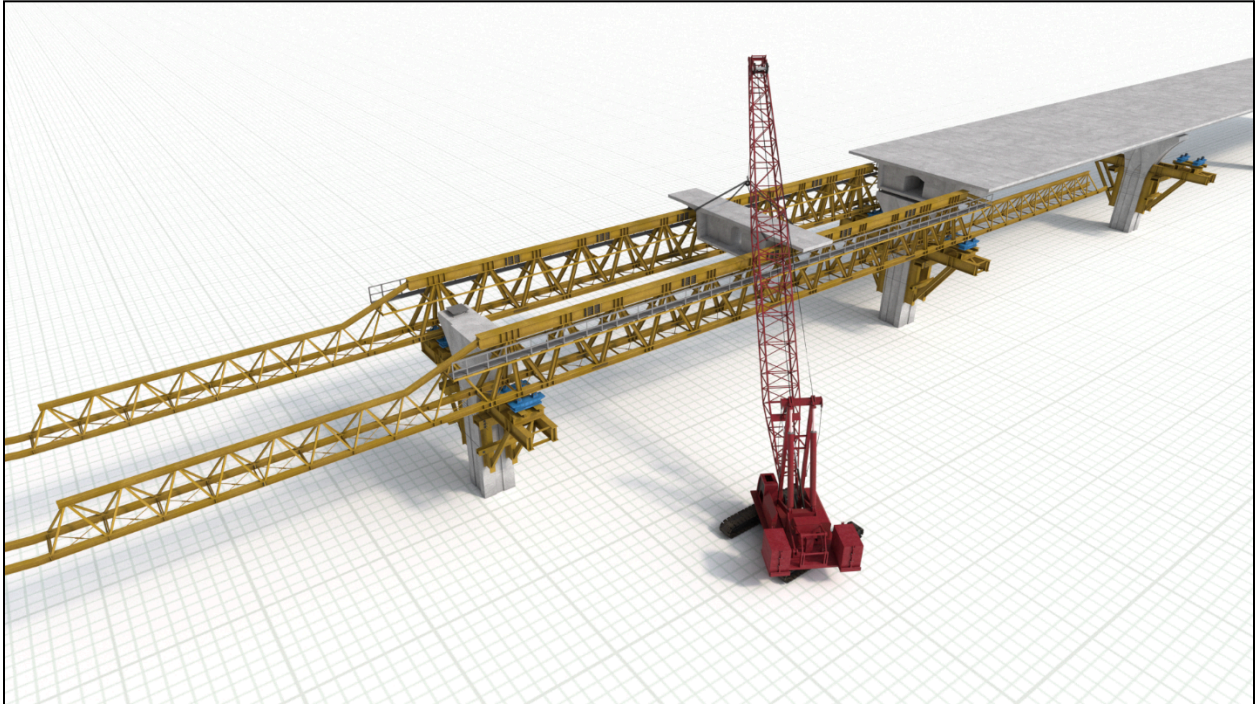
Crane Erection of Span-by-Span Bridges on Underslung Trusses
